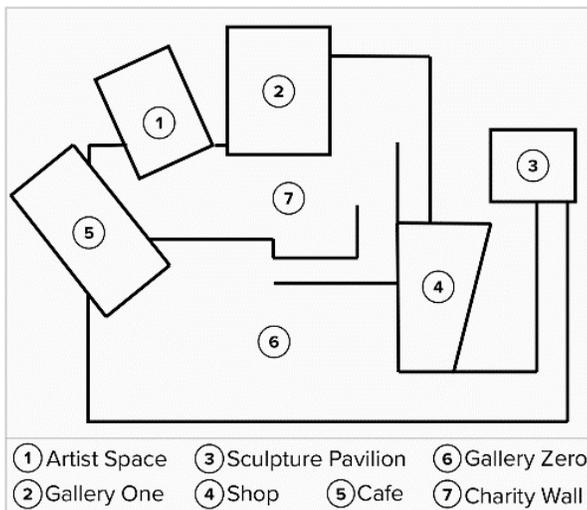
VOMA floor plan (Prepared by adapting from the URL-3)
